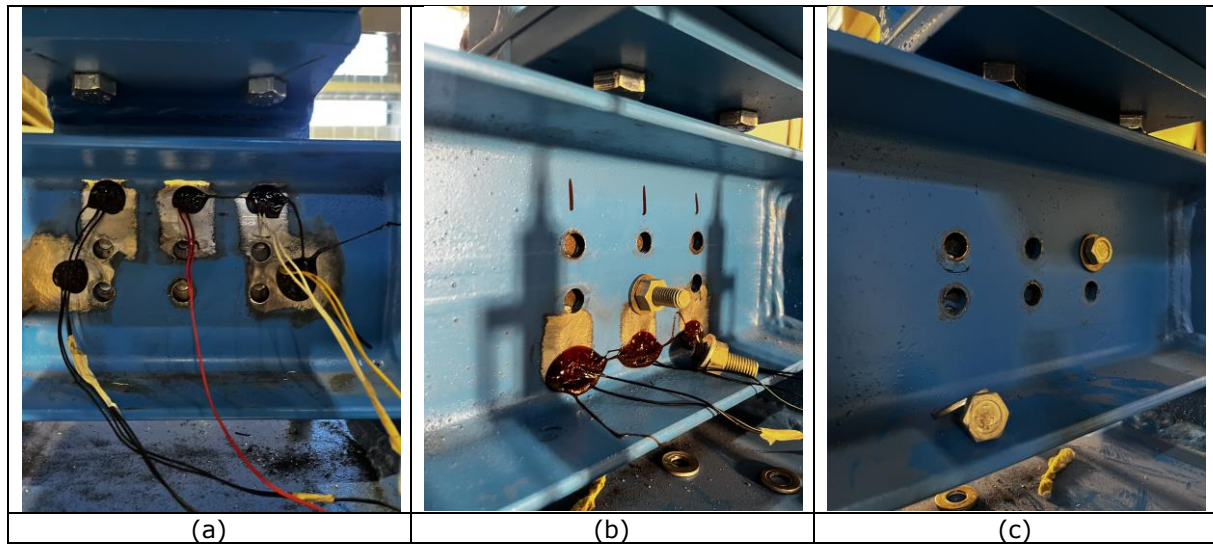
Detail 3.2 at failure: (a) frontal view of aluminium bolts under tension force; (b) frontal view of aluminium bolts under compression force; (c) movement between UPN160 elements and T plate elements after cyclic test.
